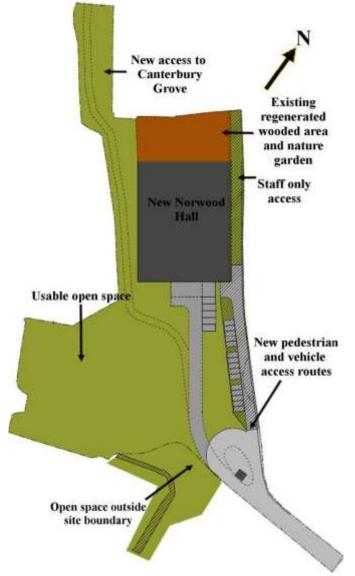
Plan of the proposed redevelopment at Norwood Hall based on an original drawing by Allford Hall Monaghan and Morris Architects Ltd (Drawing No: 08013-037)
